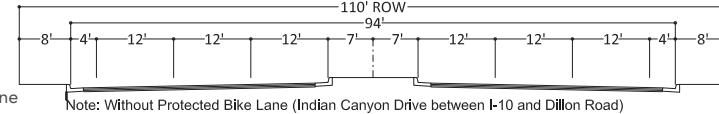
CITY OF DESERT HOT SPRINGS GENERAL PLAN ROADWAY CROSS-SECTIONS
